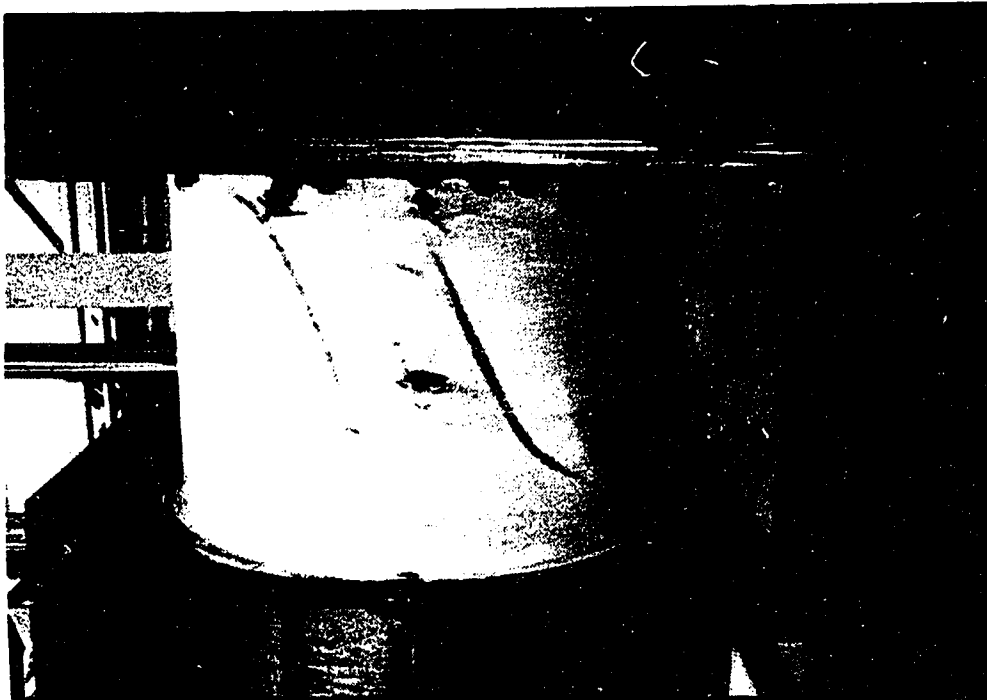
(a) Outside view of the buckled shape of Specimen S2
